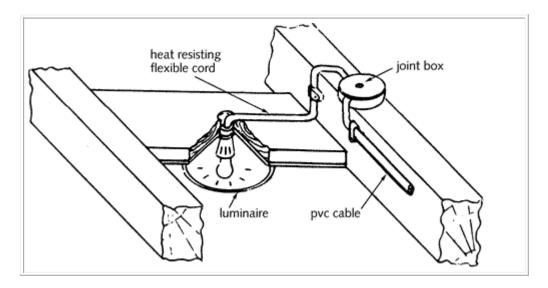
150°C rubber-insulated and braided flexible cord used for the final connection to a luminaire
